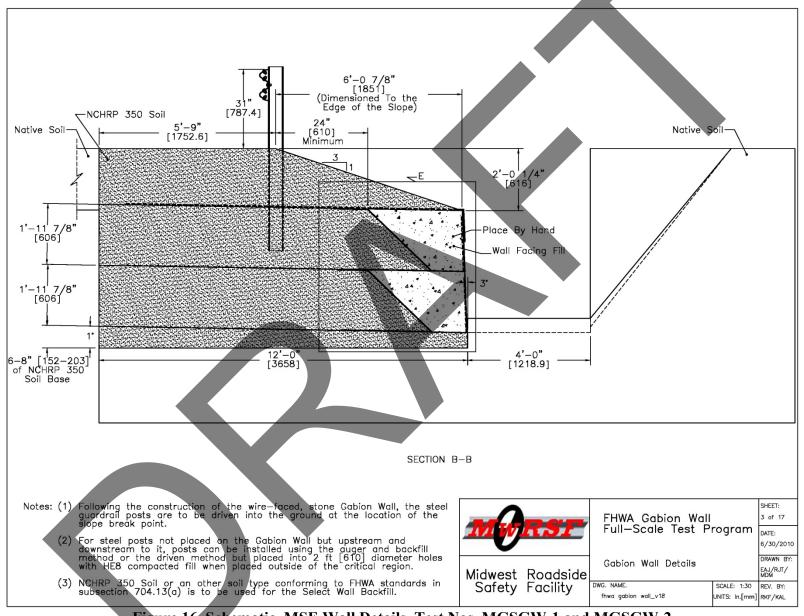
Schematic. MSE Wall Details, Test Nos. MGSGW-1 and MGSGW-2.
